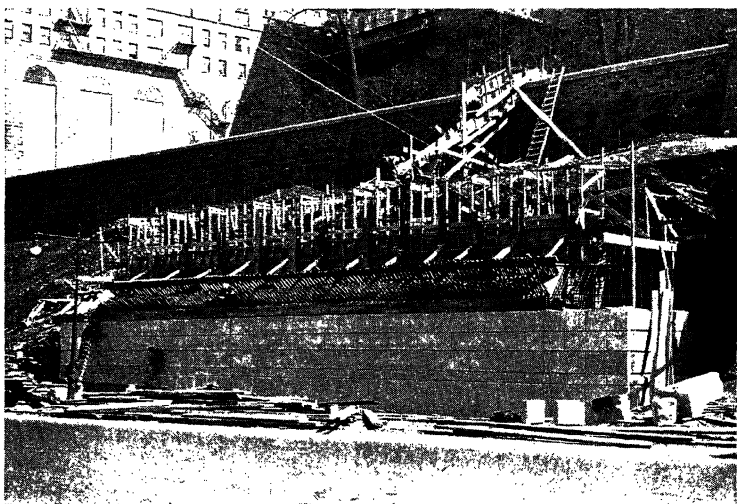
Abutment of arch over Riverside Drive, New York approach to the George Washington Bridge.
